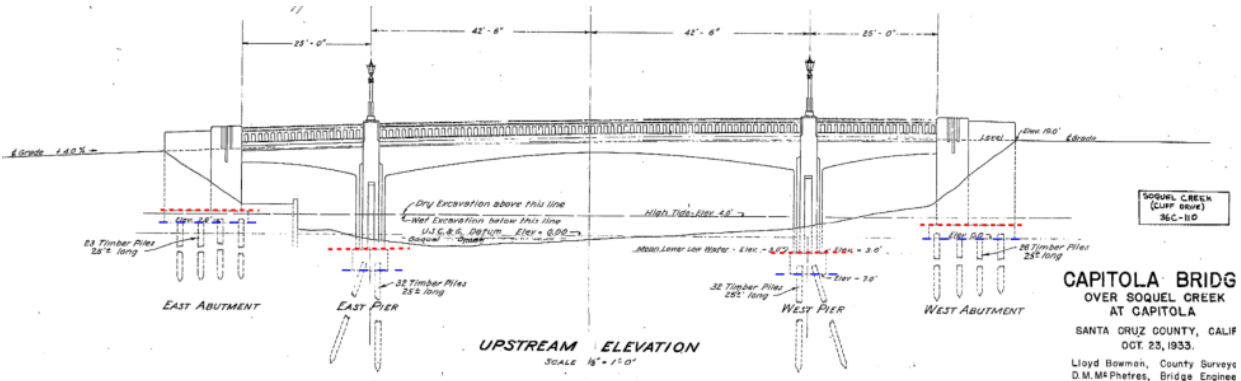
Stockton Avenue Bridge As-Built with Pile Caps Highlighted (Red is the top of the pile cap and blue is the bottom of the pile cap)
